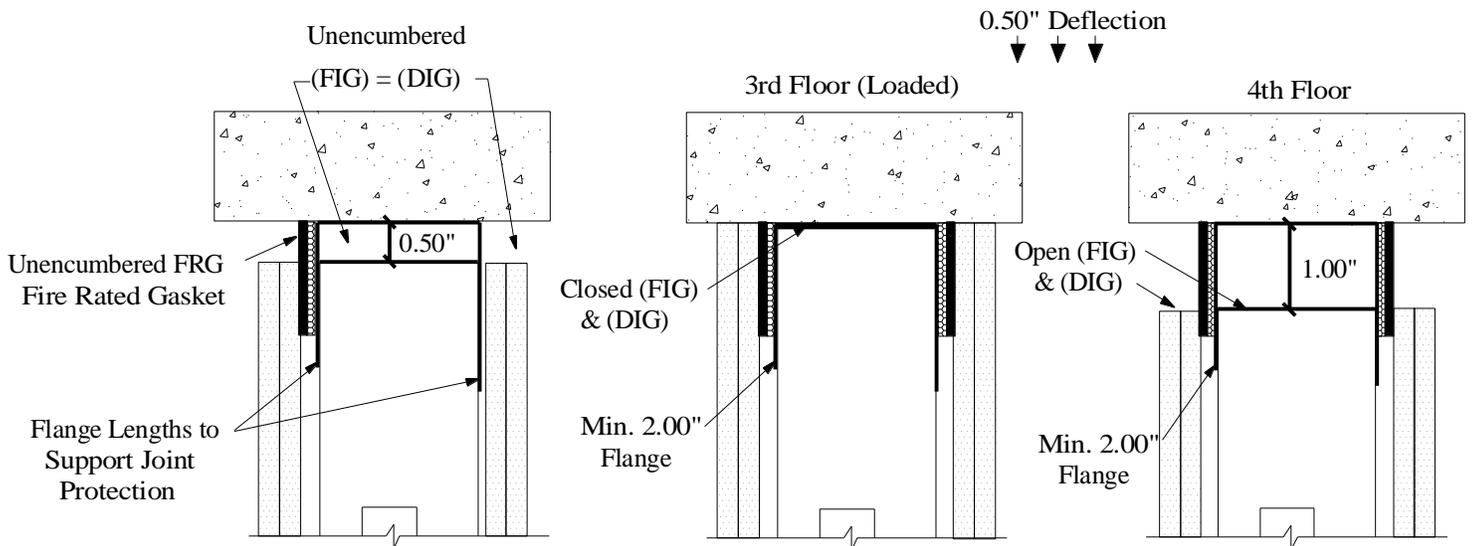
FIG - Framing installed Gap required between overhead structure and top end of wall framing (studs) to allow for one-way Compression or Downward Deflection of the structure above per Engineer of Record design. The (FIG) is to prevent vertical load upon wall framing causing it buckle, twist, or bow, and keep the entire assembly from cracking, crushing, and dislodging while maintaining Life Safety rated Fire, Smoke, and or Sound resistance.
